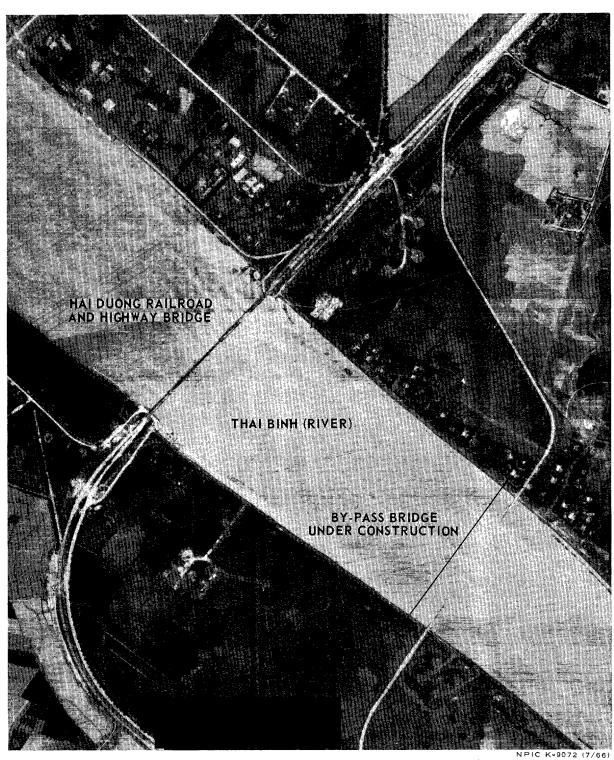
RAILROAD BY-PASS BRIDGE UNDER CONSTRUCTION, HA NOI/HAI PHONG RAIL LINE, NORTH VIETNAM
